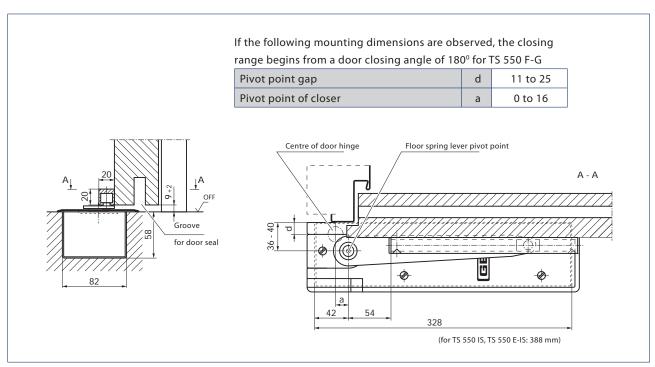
· Installation example: floor spring with lever and guide rail (surface-mounted) to a rebated timber door
